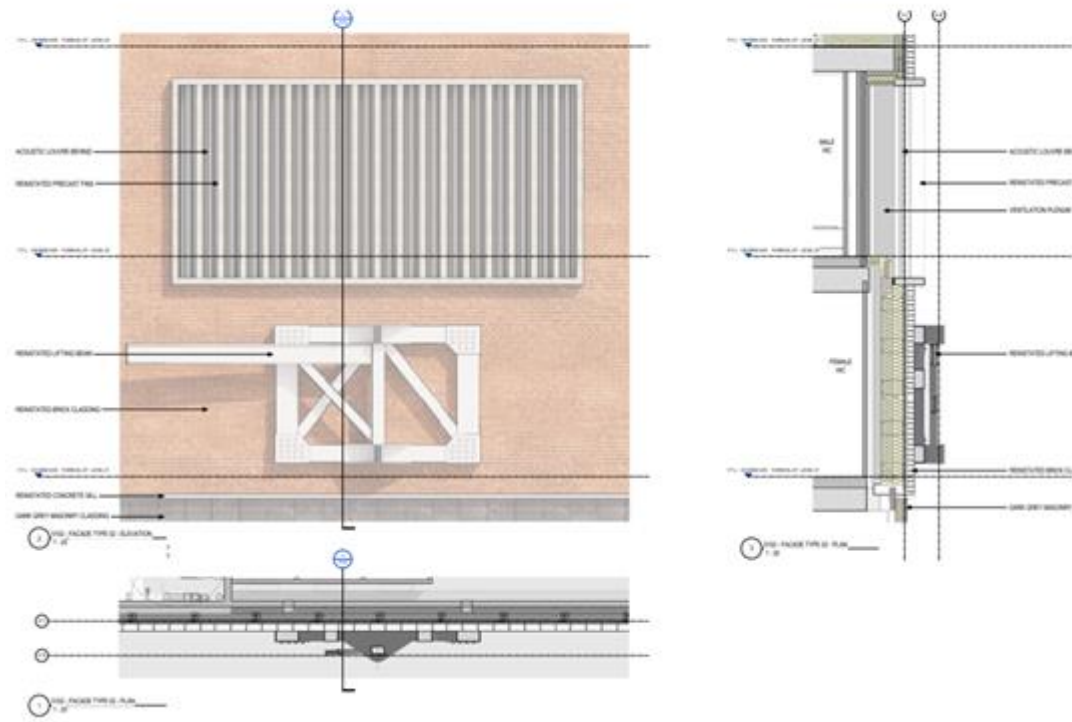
Façade options for 38-39 and 40-41 Furnival Street
